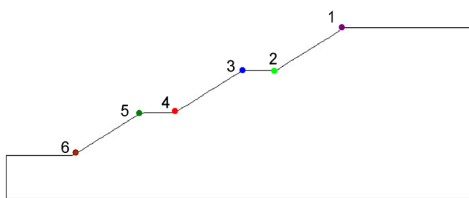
Triple stage dump (90 m height and 24° overall slope angle) with six monitoring points.
